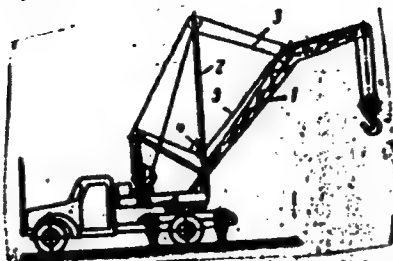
1 - boom; 2 - strut; 3 - boom pulley system; 4 - diverting pulley; 5 - load cable.
